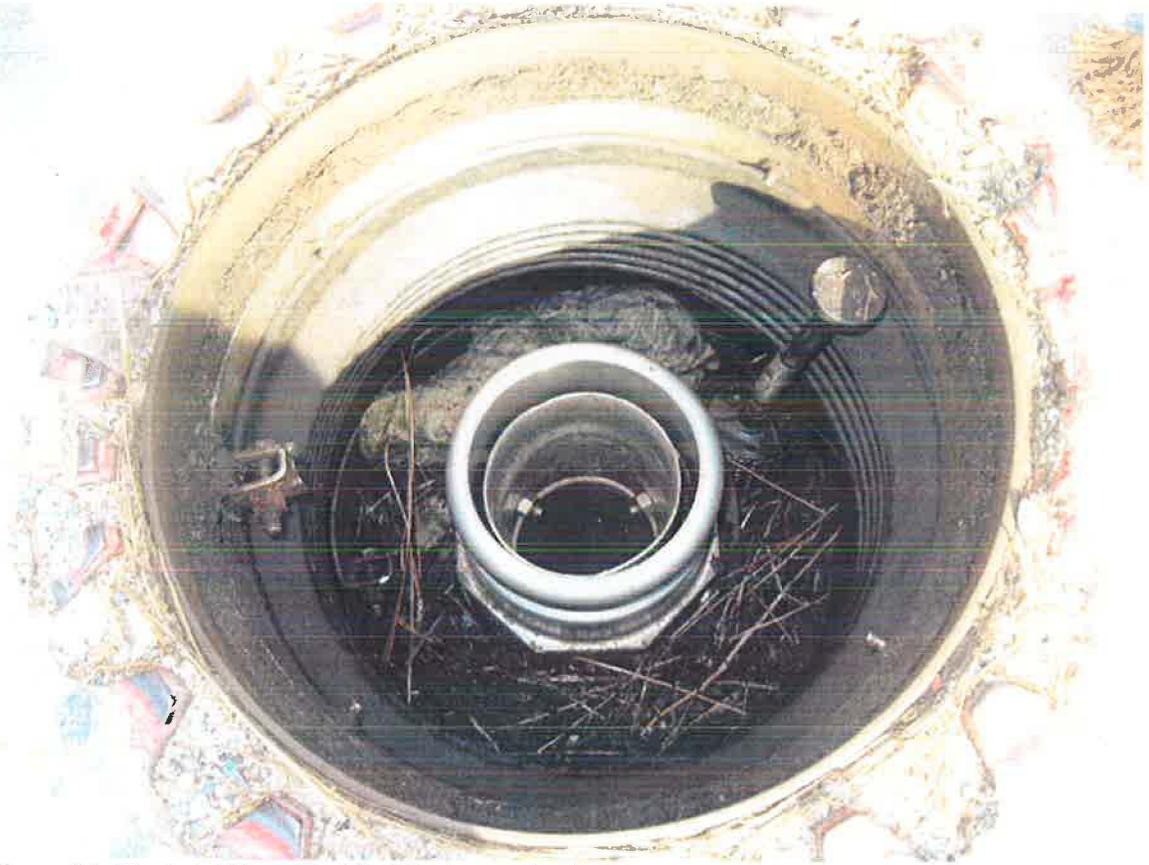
Tank 1 fill port with fill pipe and spill bucket.
